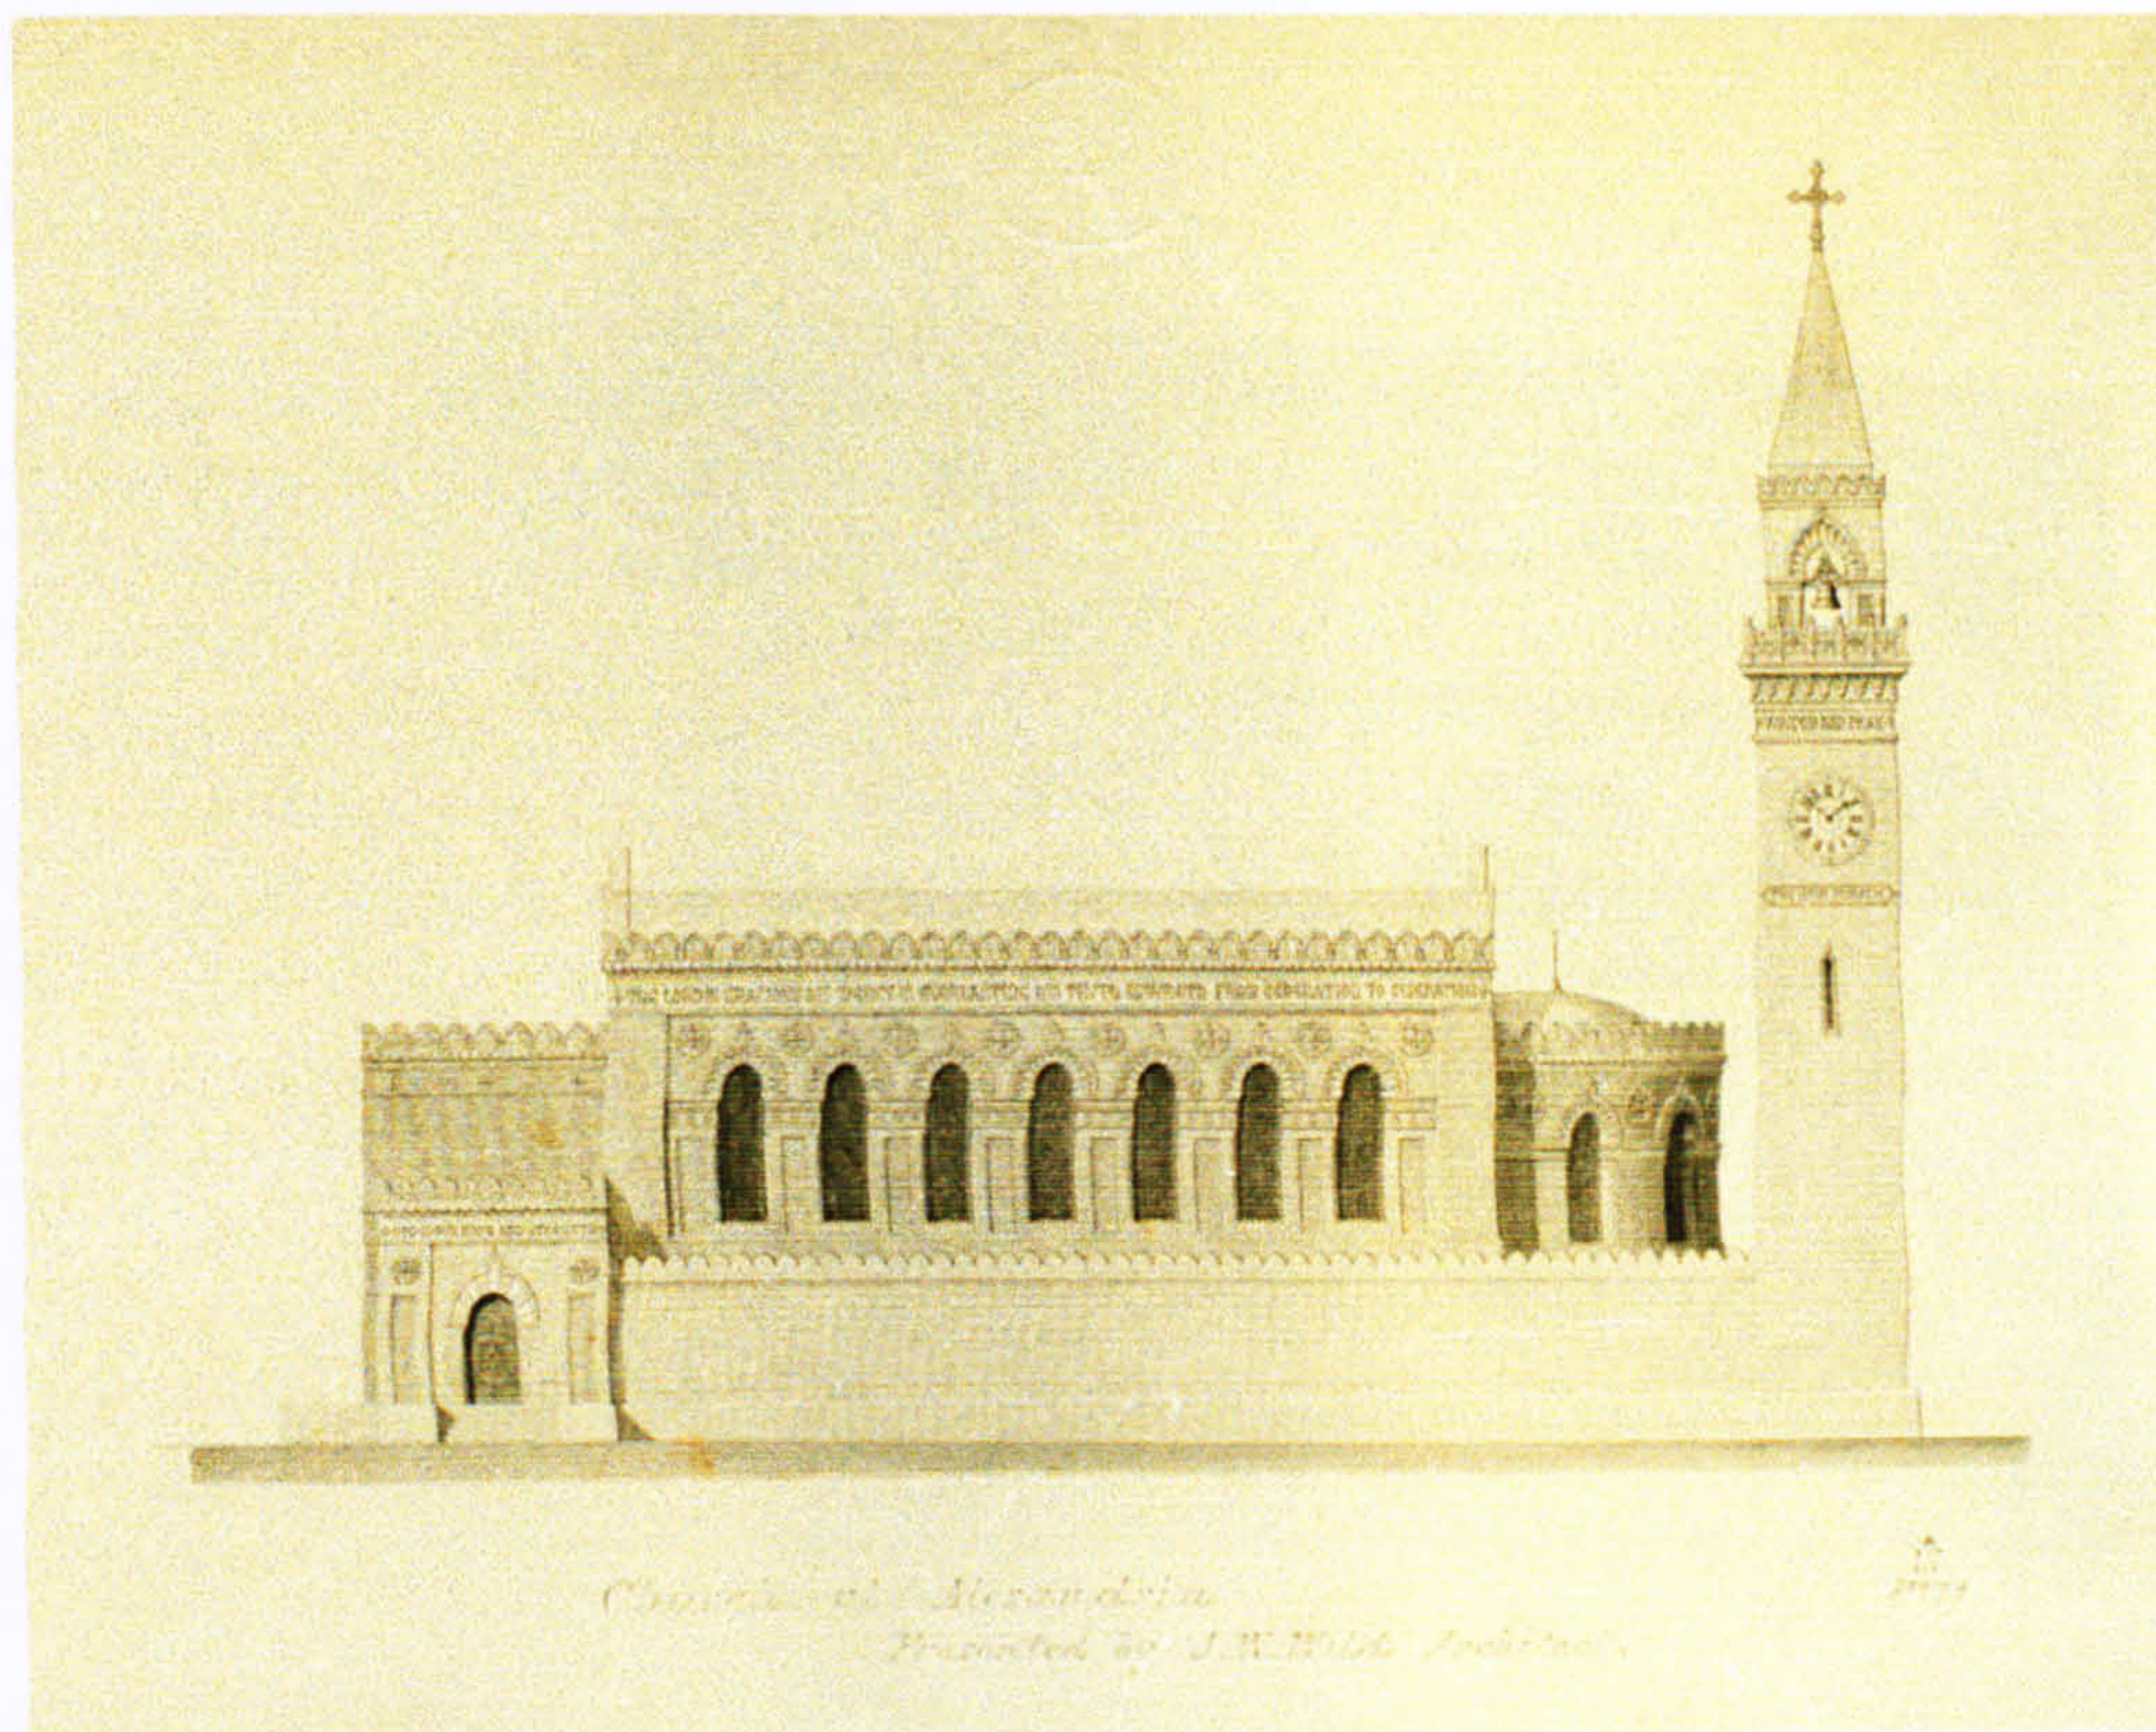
St Mark's Church, Alexandria: drawing of south elevation
